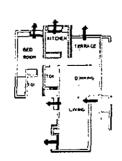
First floor Fig 5.3.12 Sec floor Fig 5.3. Upper floors are more secure because of single entry to a dwelling.
